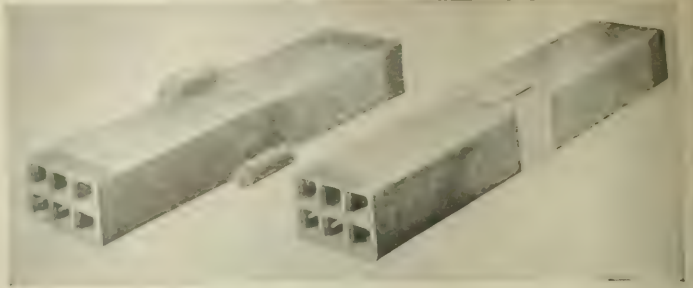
MAKING JOINTS ON MULTIPLE DUCT CONDUIT.
